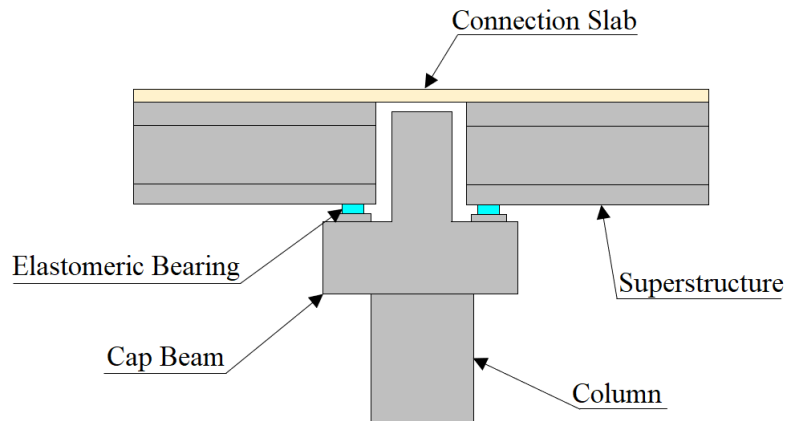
Gaps between girder ends and cap beam wall at pier lines
